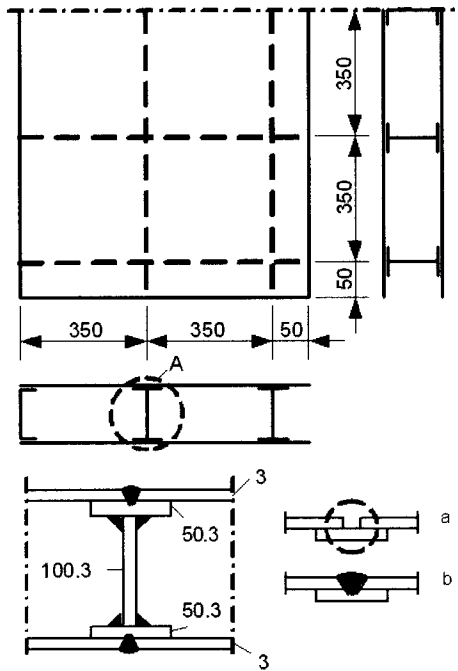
Dimensions of the welded steel cellular plate model
